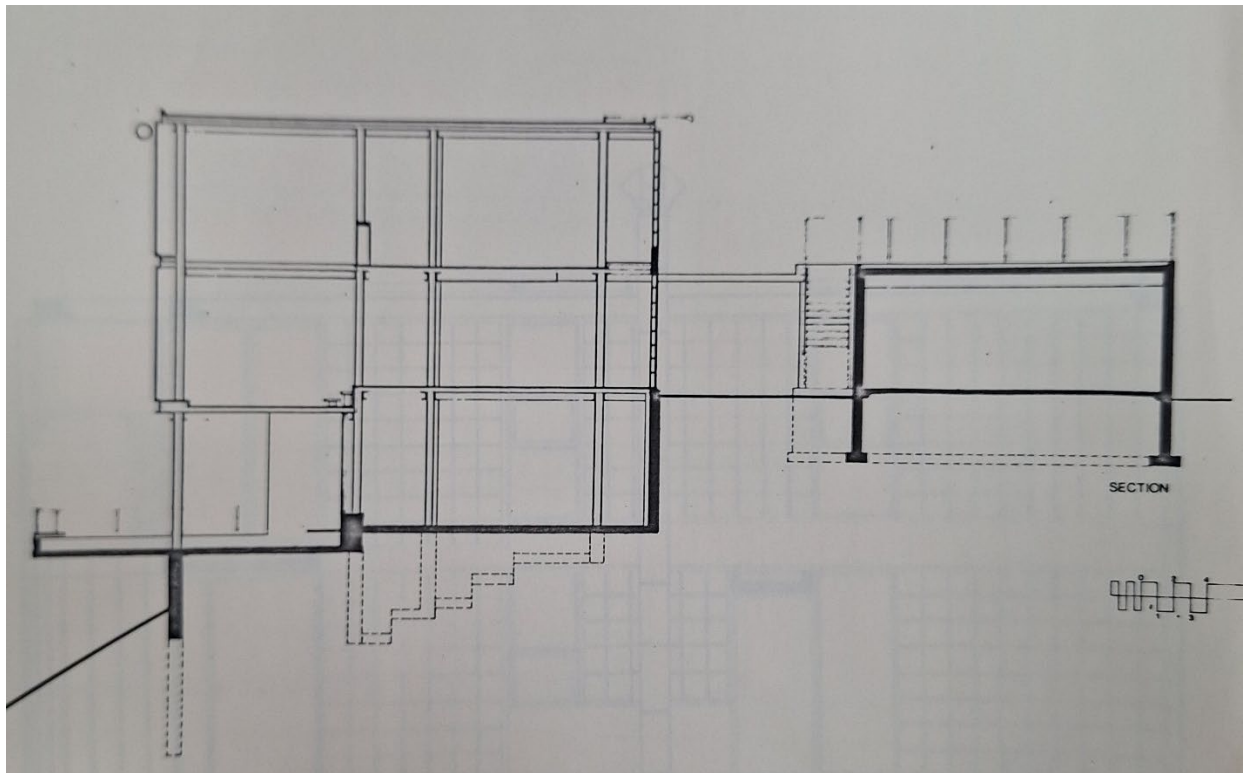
Section drawing of 2 Hedgewood Road showing the two-level basement and first storeys and cantilevered basement terrace (Hamilton, Ridgeley, Bennett Architects, 1974).
